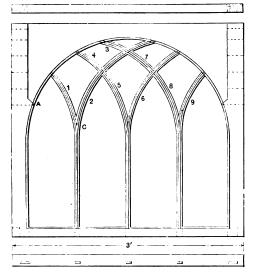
Plan and Elevation of Upper or Top Sash.
